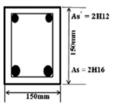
Main reinforcement arrangement & dimensions of The beam
